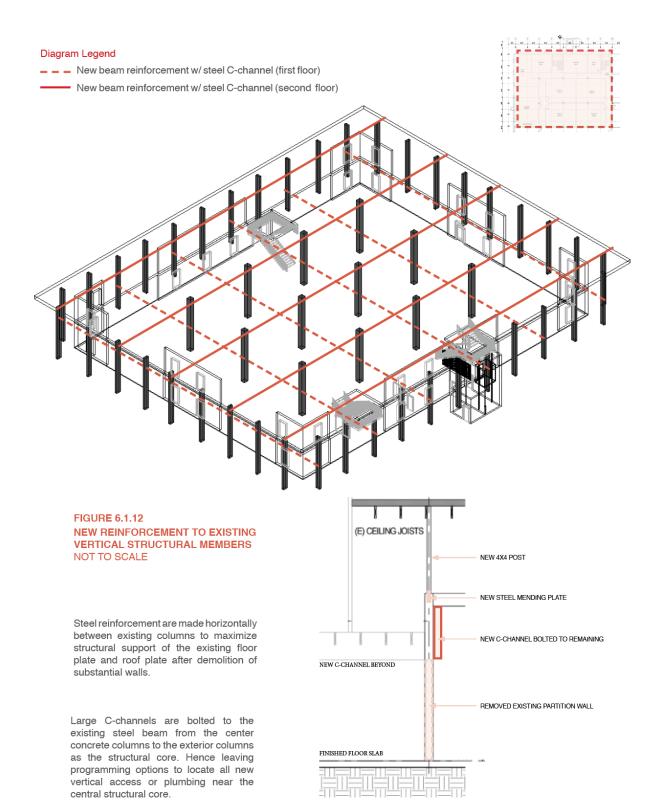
NEW BEAM REINFORCEMENT PATH DIAGRAM
